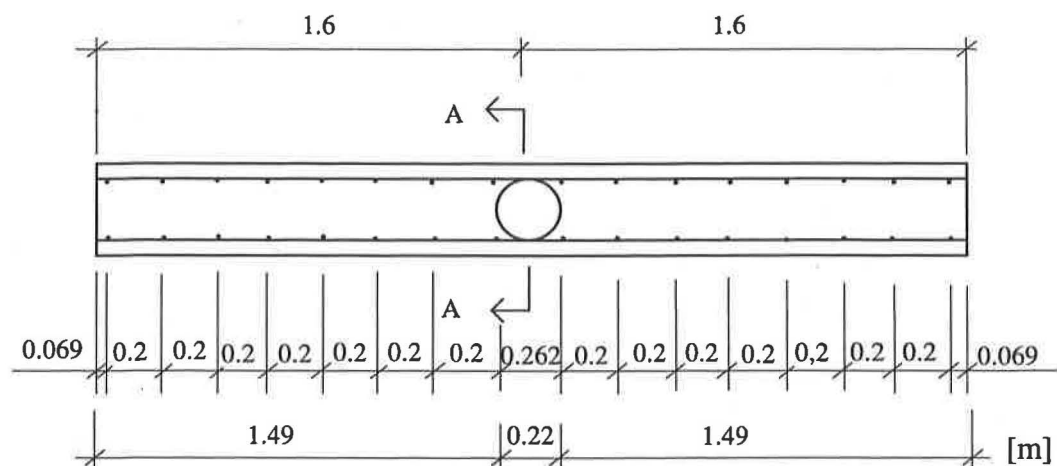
Reinforcement detailing of specimen RV14 (side elevation).
